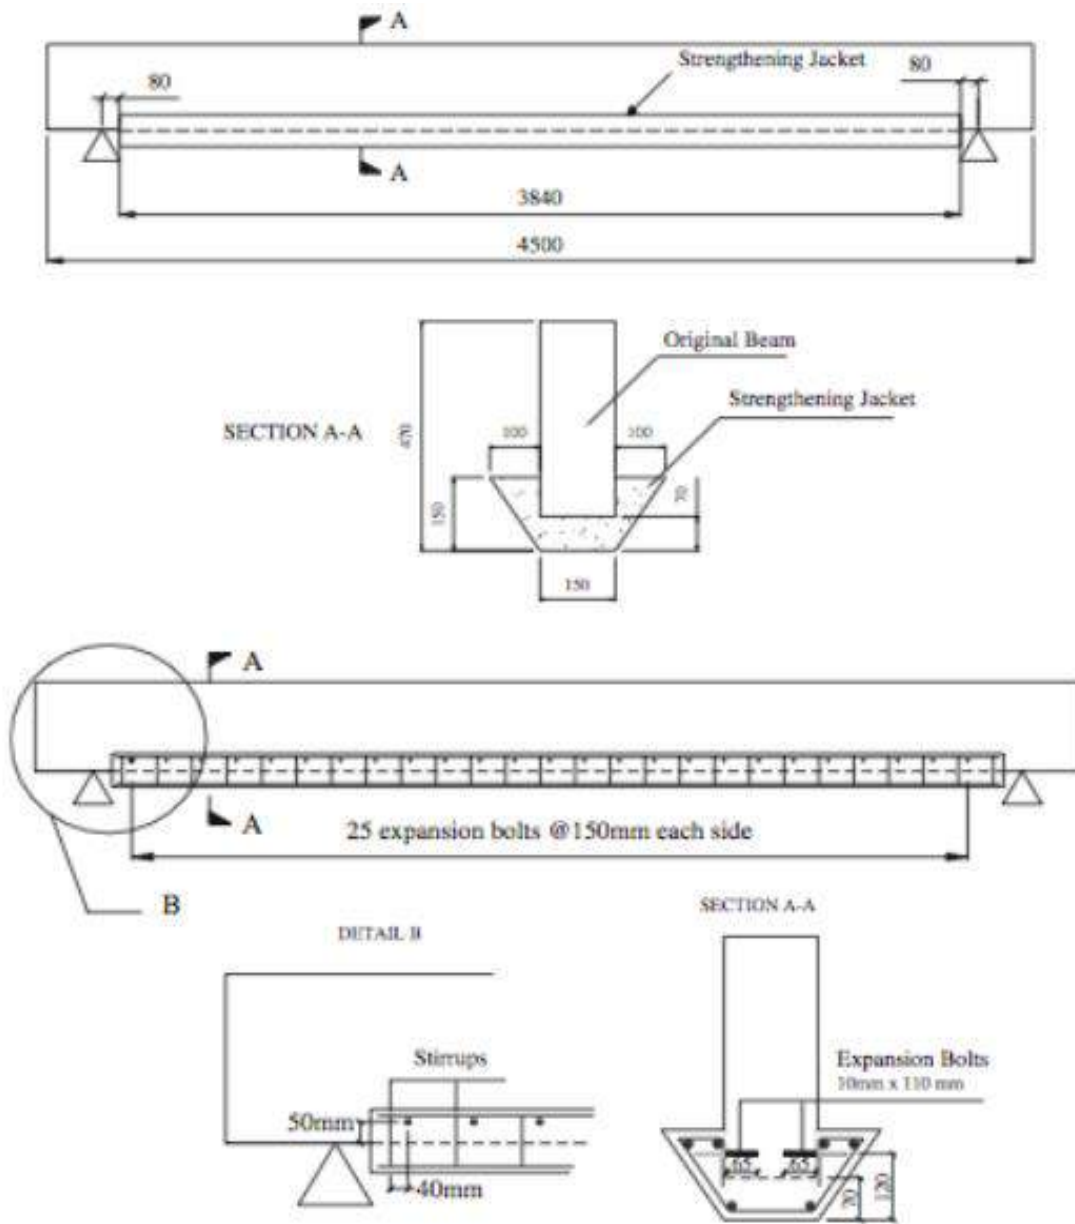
Strengthening details of specimen tested (Source: Shehata and Shehata, 2008).
